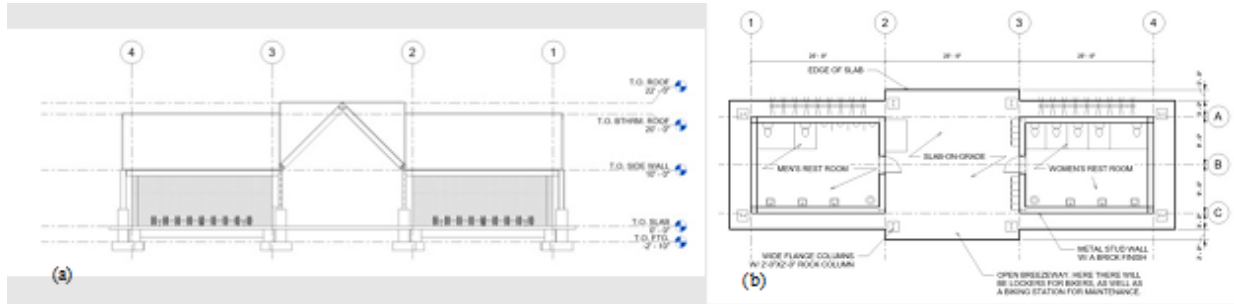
Buff Trails (a) Elevation View and (b) Plan View
